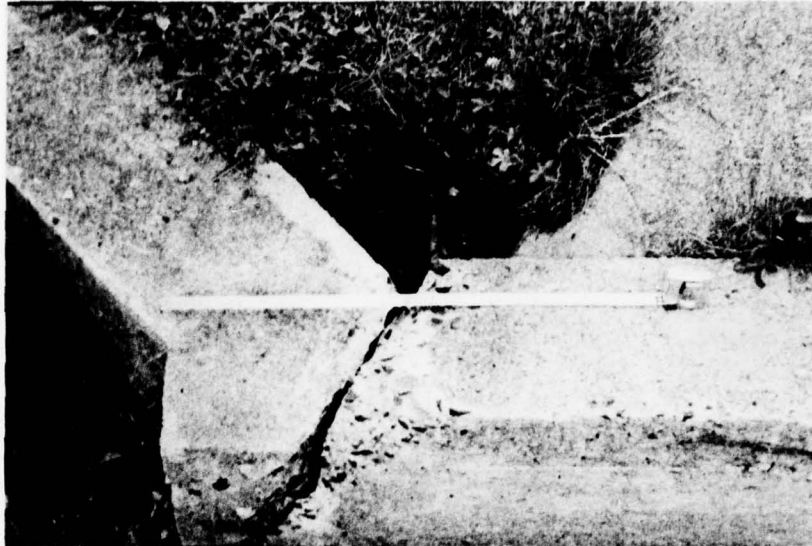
Erosion and settlement of wingwall at left side of approach to masonry spillway.
